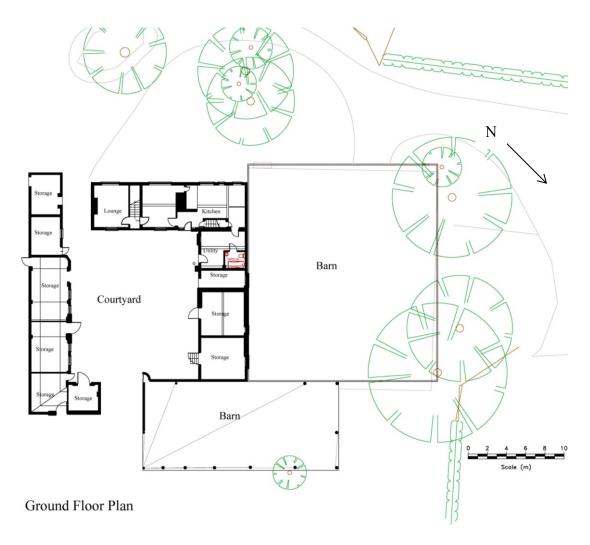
Site layout and existing ground floor plan Modified from Corporate Architecture Ltd drawing
